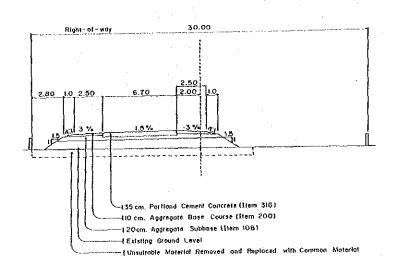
TYPICAL SECTION PLARIDEL BY-PASS/CABANATUAN ALTERNATIVE ROUTE
